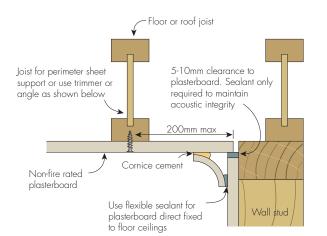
Floor Joist Support For Ceiling to Wall Direct fixed to joist
